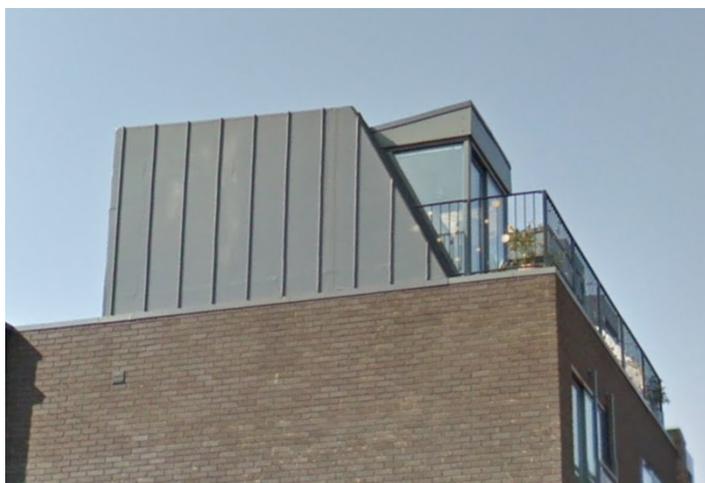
Photograph showing the side facing dormer window to neighbouring no.86 Margery Street
